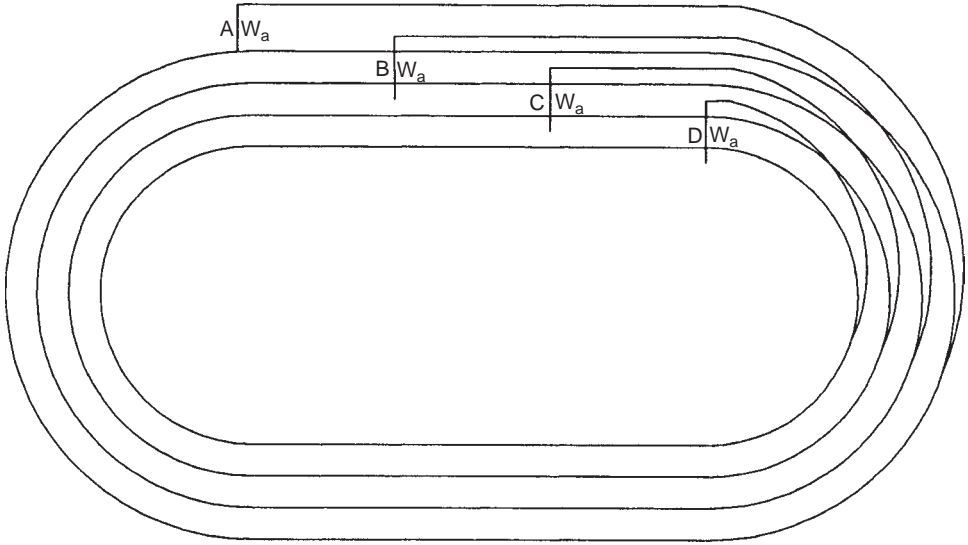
Drawing the new crest lines (Steps 3 and 4).
